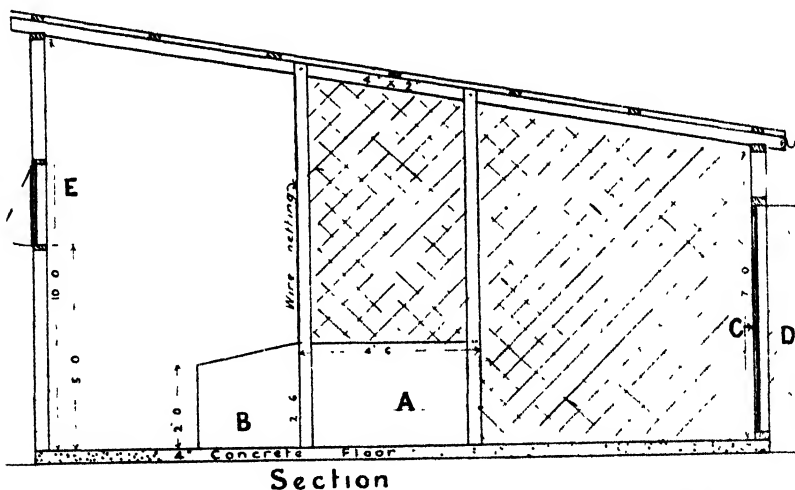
Section of cold brooder house. (A) Asbestos sheet to prevent draughts. (B) Cold brooders. (C) Wire netted gates leading to outside runs. (D) Outside runs. (E) Stock size windows hinged at top or louvre windows.
